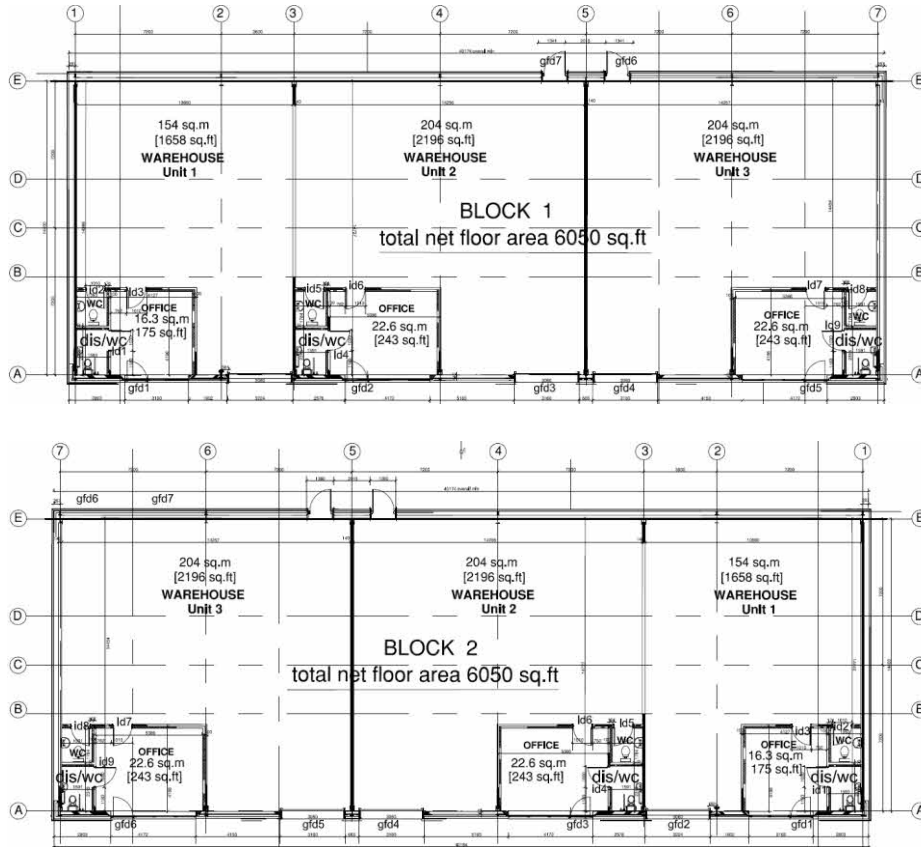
Proposed floor plans for the proposed 2No. blocks at Site A
